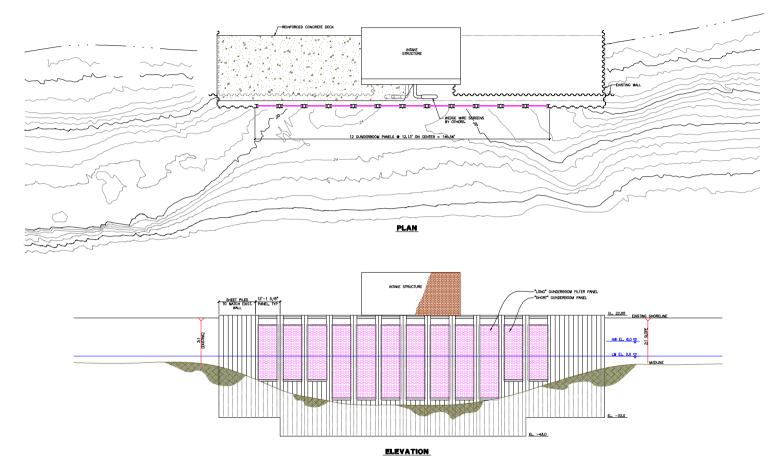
Example of a MLES layout (Gunderboom Inc.)
